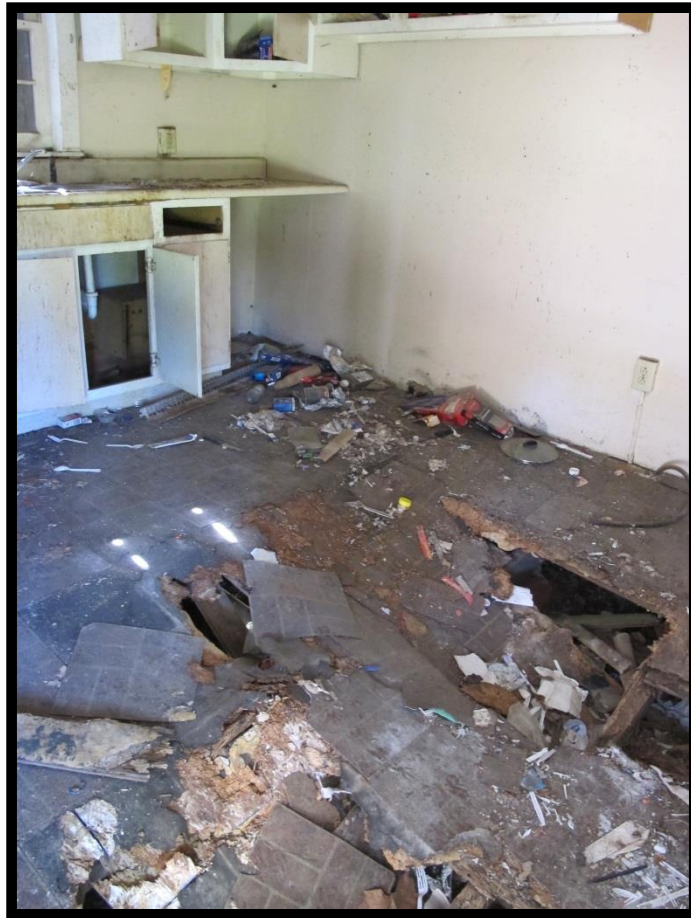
Alex Brinson House (# 1), Interior Kitchen.
